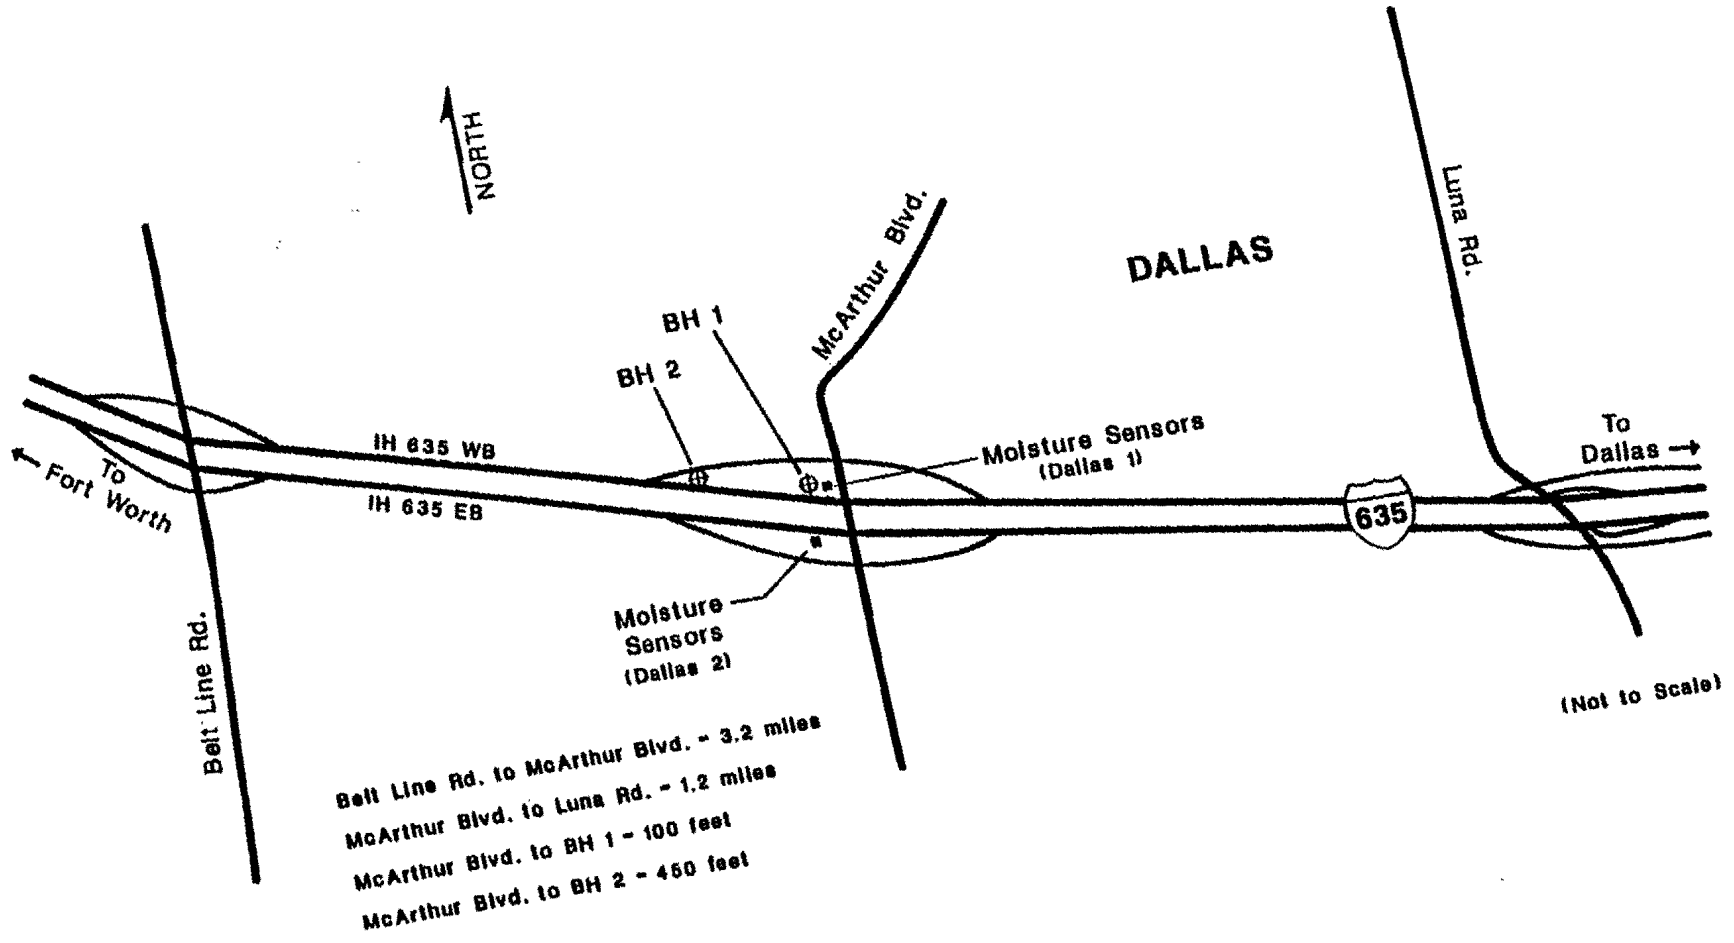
Site Plan of Test Sections at Dallas, IH 635
